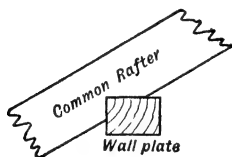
Bird's-mouth Joint for Roof with Eaves Gutter.
